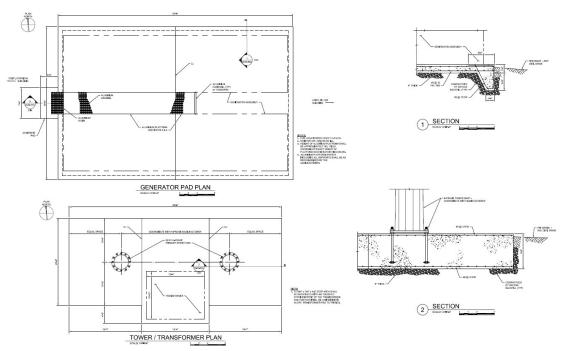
The generator and tower foundation for a proposed expansion in 2011 was never constructed. We have assumed that the new generator and tower foundations will be similar.
